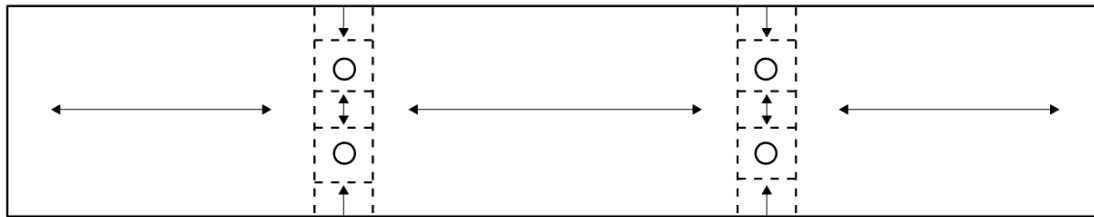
Assumed transfer of shear forces within the bridge deck slab.
